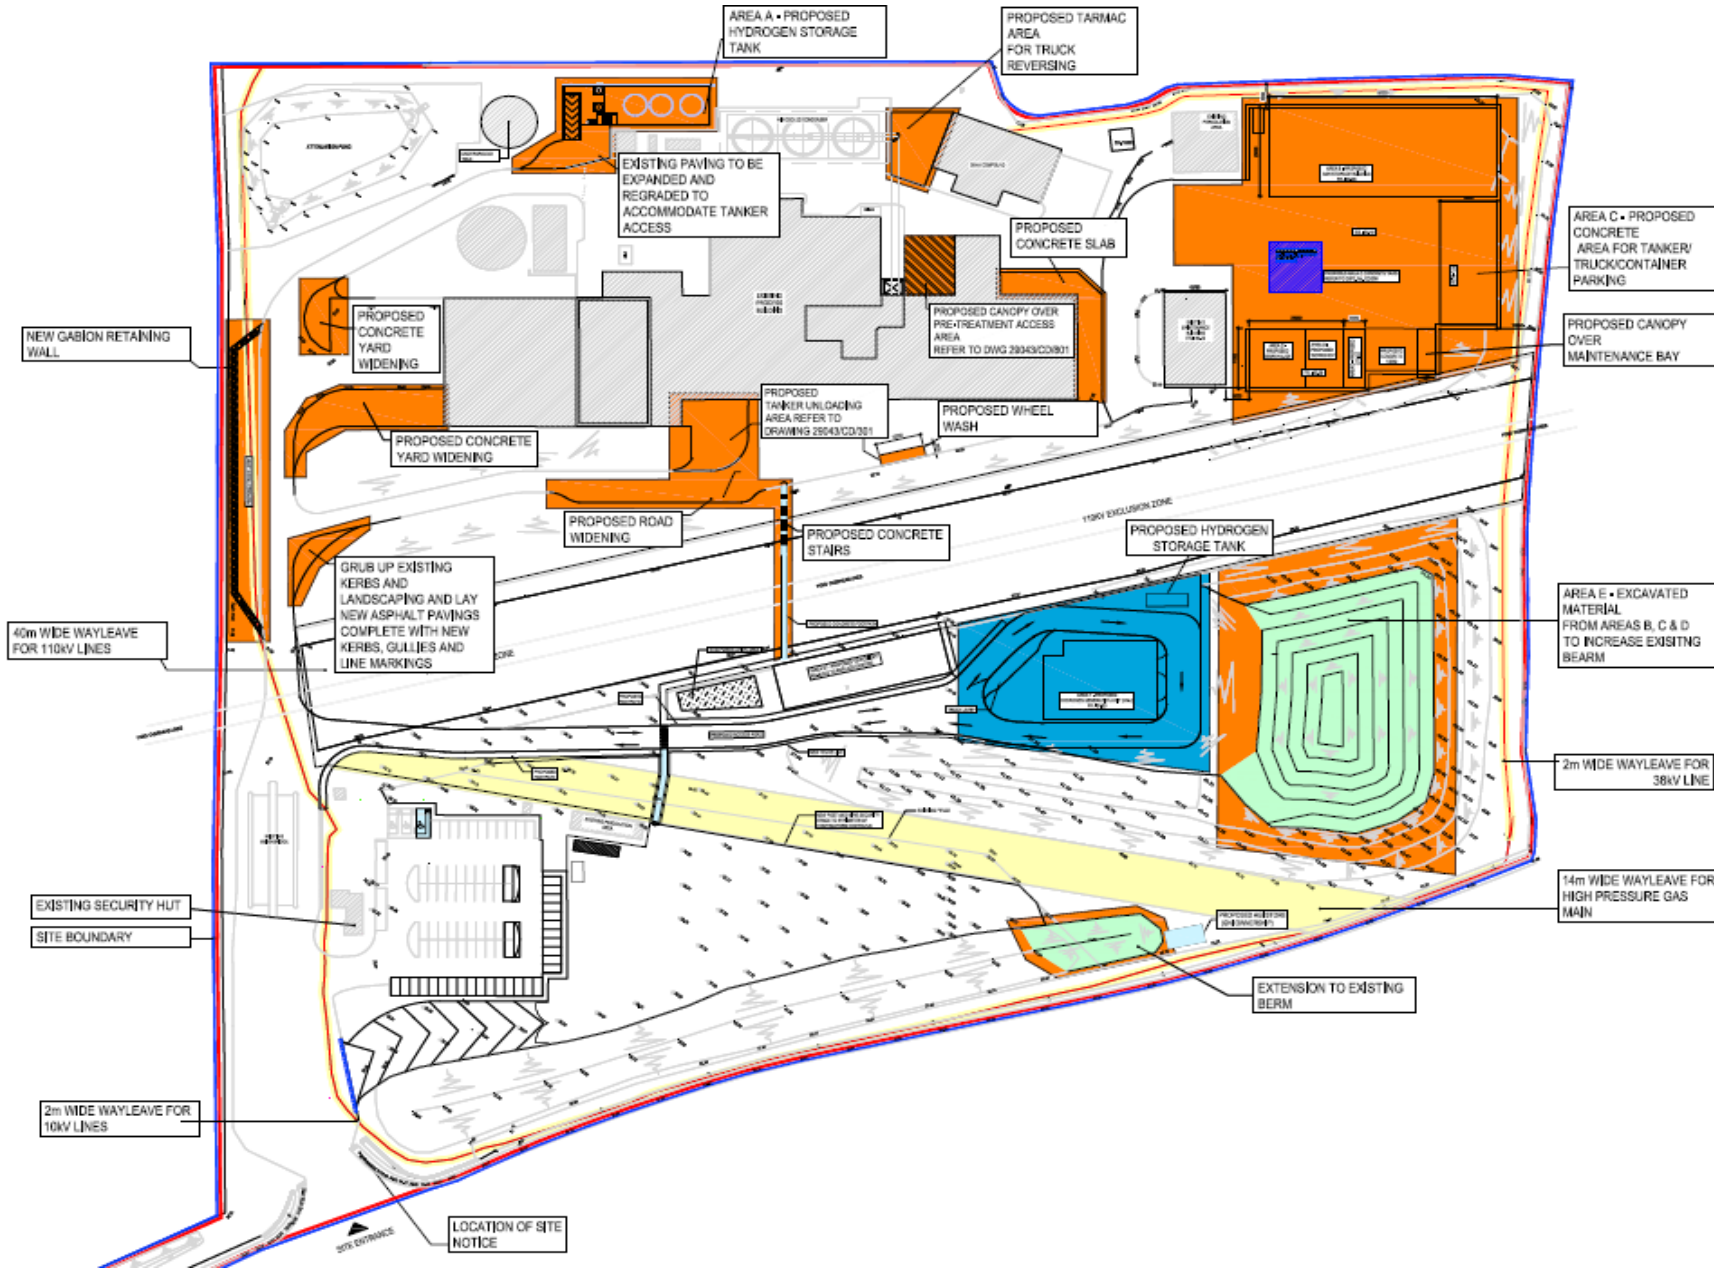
Phase 1 construction areas and site compound (highlighted blue). Source Drawing 29043-CD-1101 (refer to Appendix 5.2).
